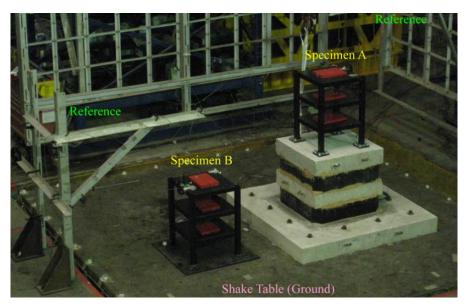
Test setup: structure with periodic foundation (specimen A) and structure without periodic foundation (specimen B) ([42])
